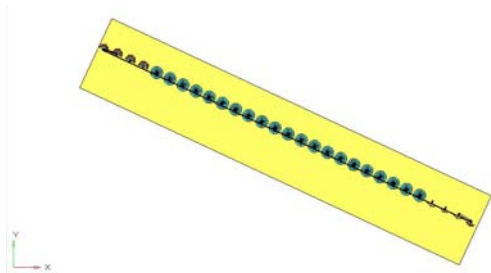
NCAC strong-post W-Beam guardrail, overhead view
